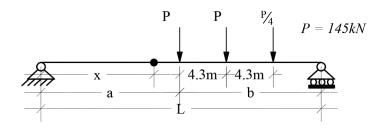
Design Truck Load Arrangement for Deflection Calculation
